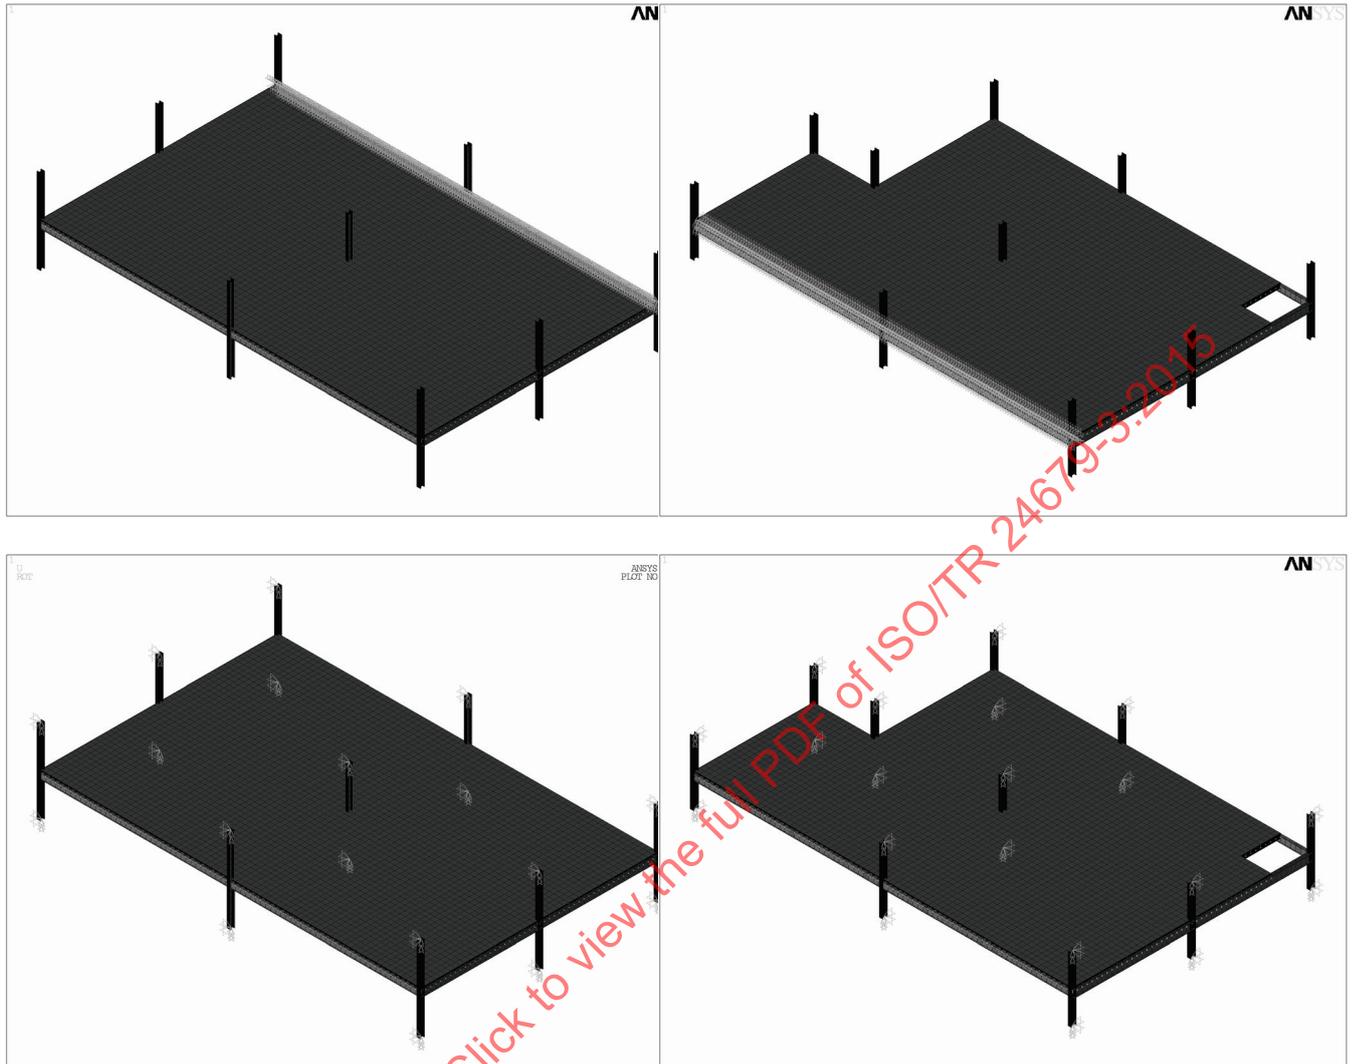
Modelled structure for fire scenarios (left) S1.3 on ground floor and (right) S2.2 on an intermediary floor level
